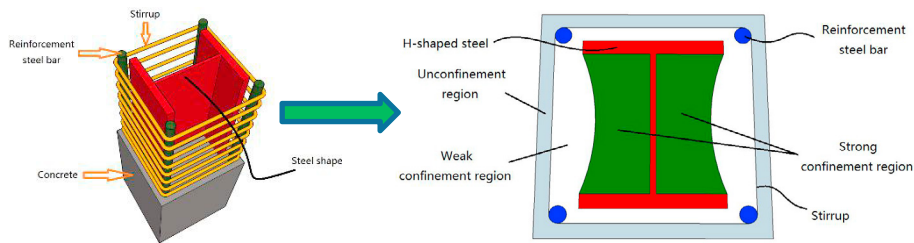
The details of different elements in Steel Reinforced Concrete members
